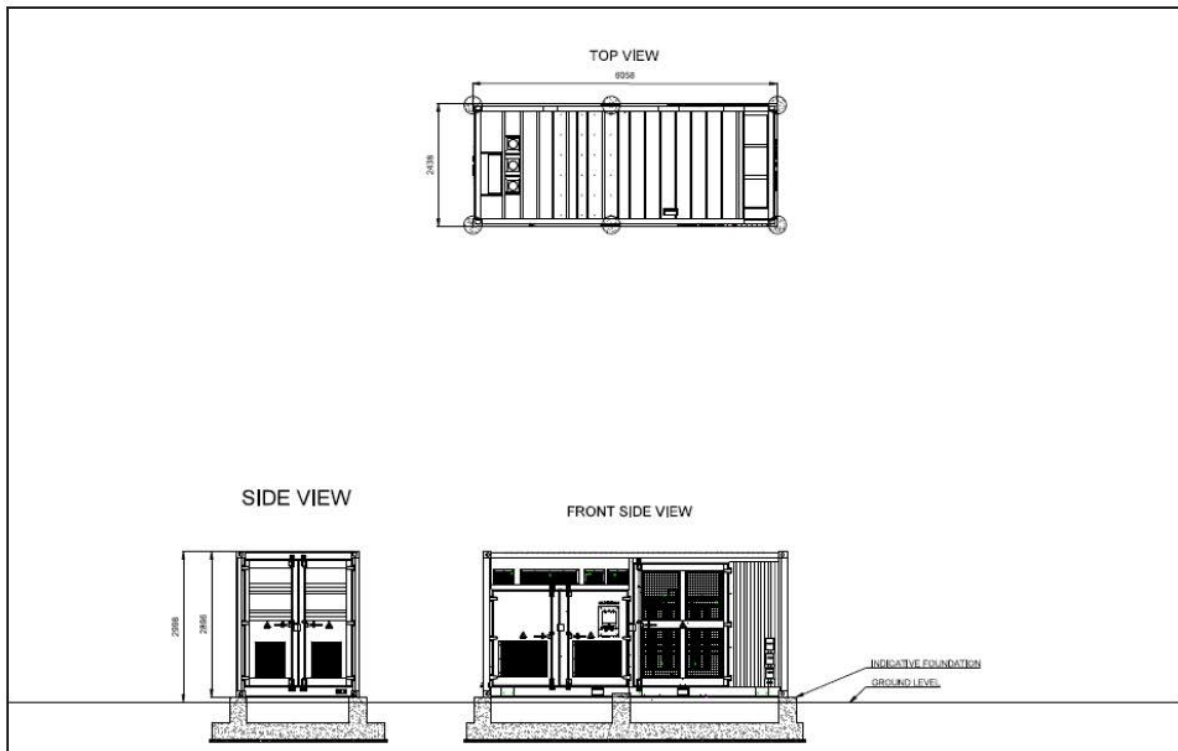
Power Station Elevations – Inverters, Switchgear and Transformers
